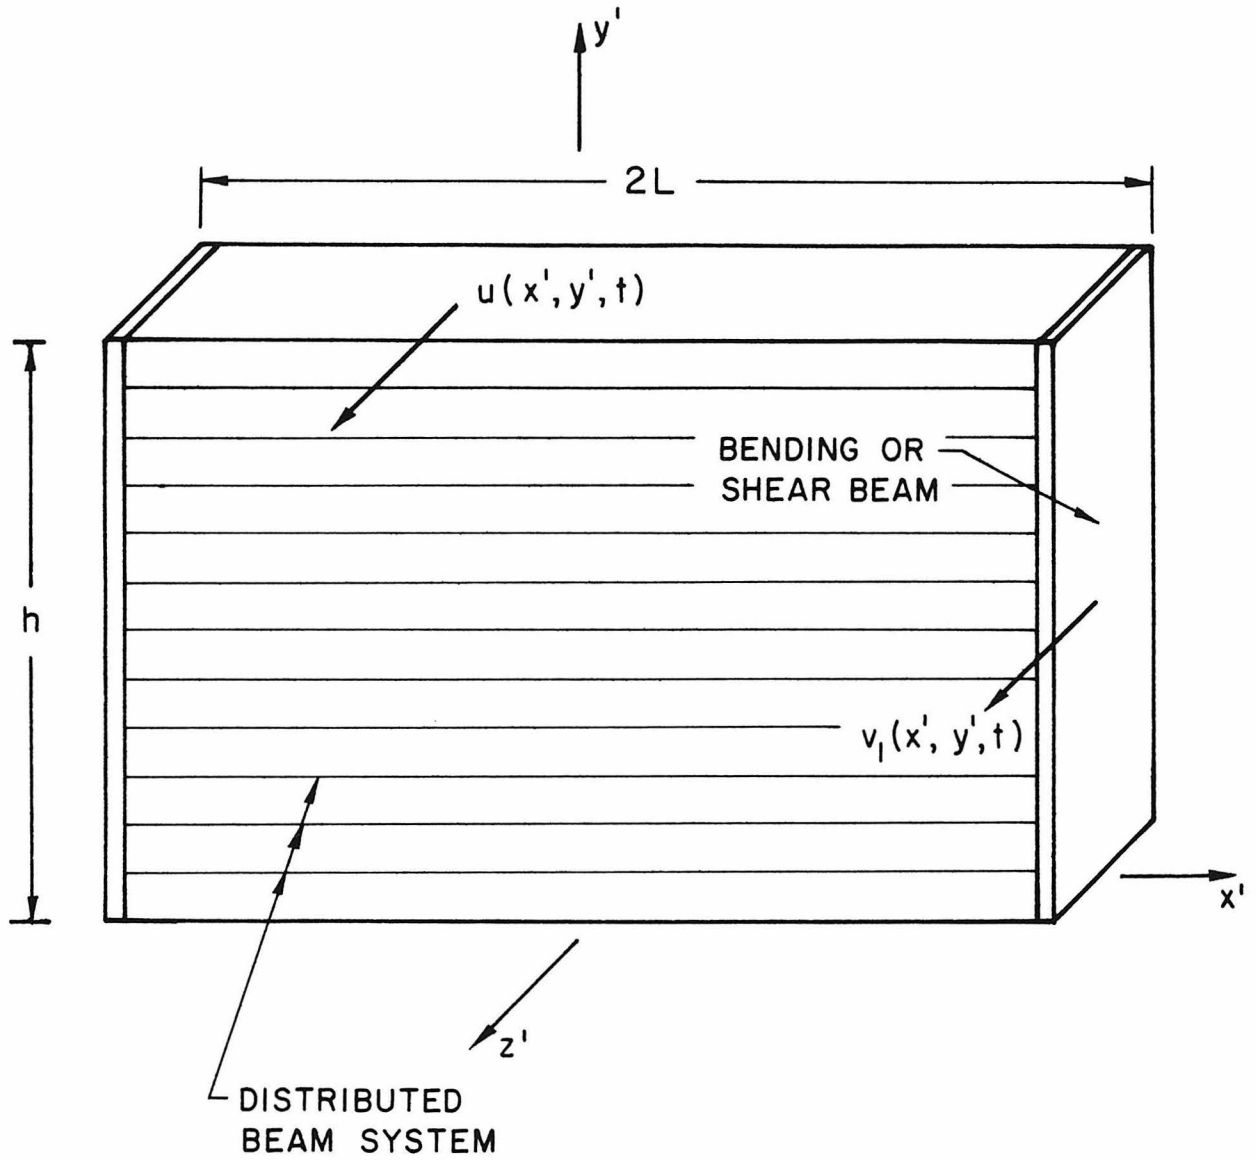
MODEL OF A MULTISTORY BUILDING WITH END WALLS OR FRAMES.
